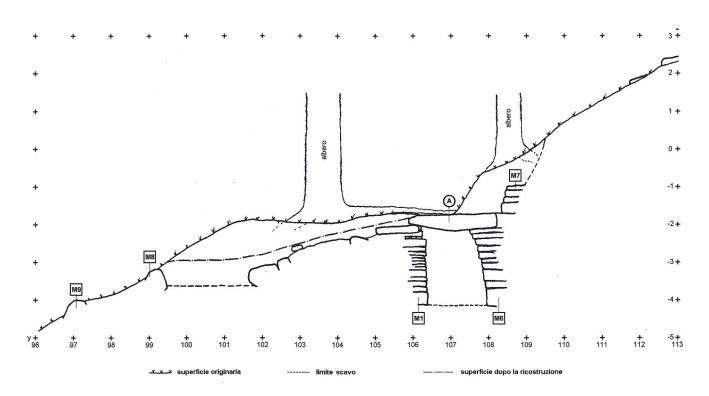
House 1: Section on x86 (transversal) view towards SW with the entrance walls and the monolithic architrave (1:100)
